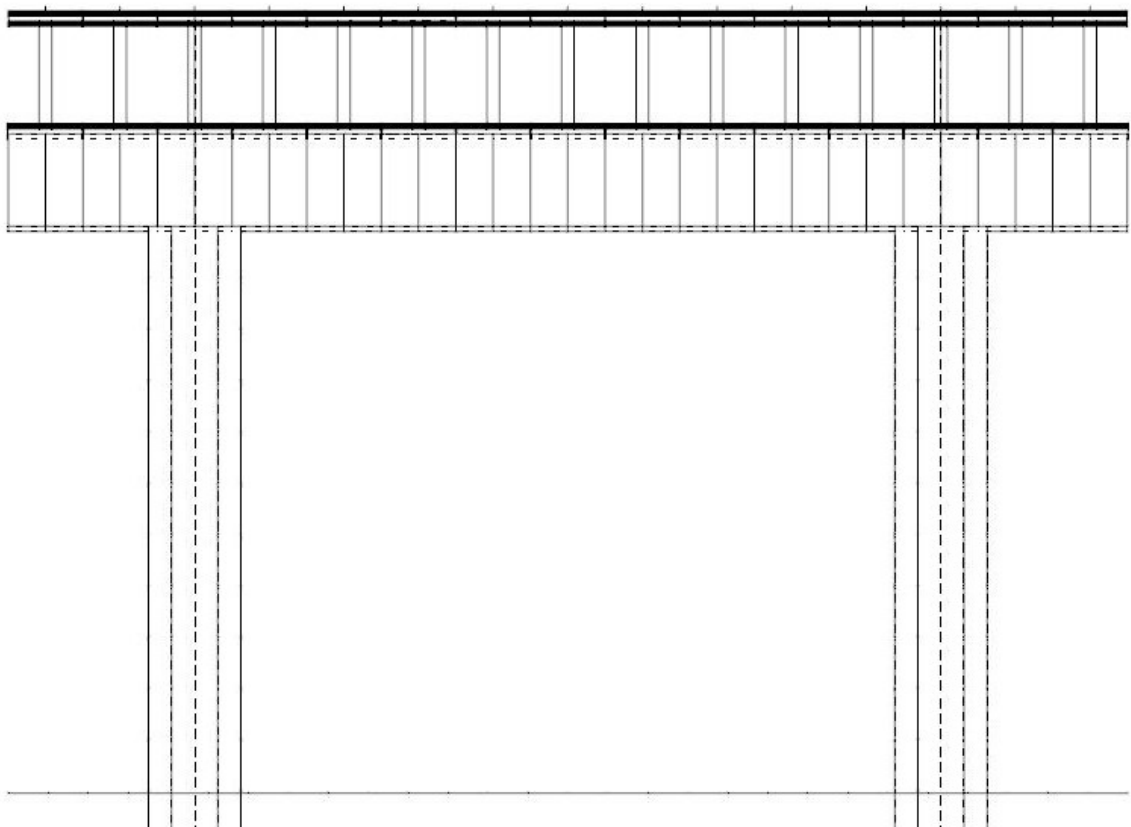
Cross-sectional view of the approach bridge with substructure.
